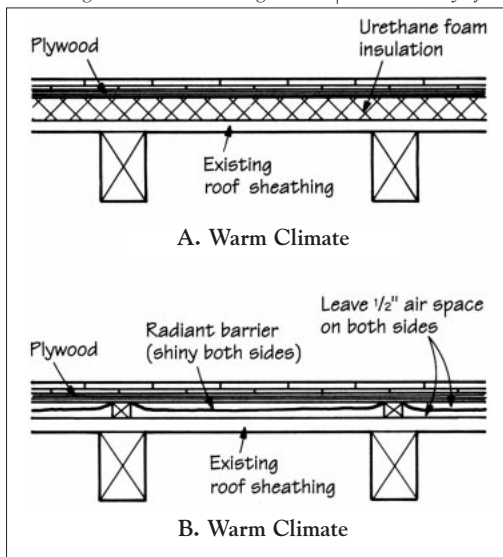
Two options for retrofit roof insulation over an exposed ceiling. The most common method is to install a urethane foam insulation board and a new plywood deck over the existing sheathing (A). In warm climates, a second possibility is to install a new roof deck on 2x2 sleepers over the existing sheathing, with a radiant barrier between the old and new roof decks (B).
